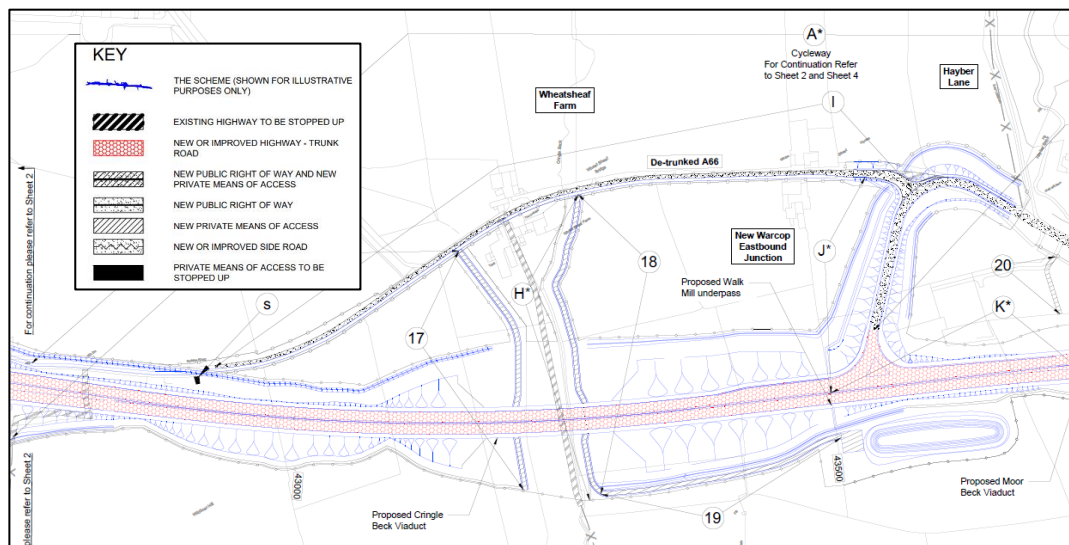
(f) Extract from Rights of Way and Access Plans (After)
